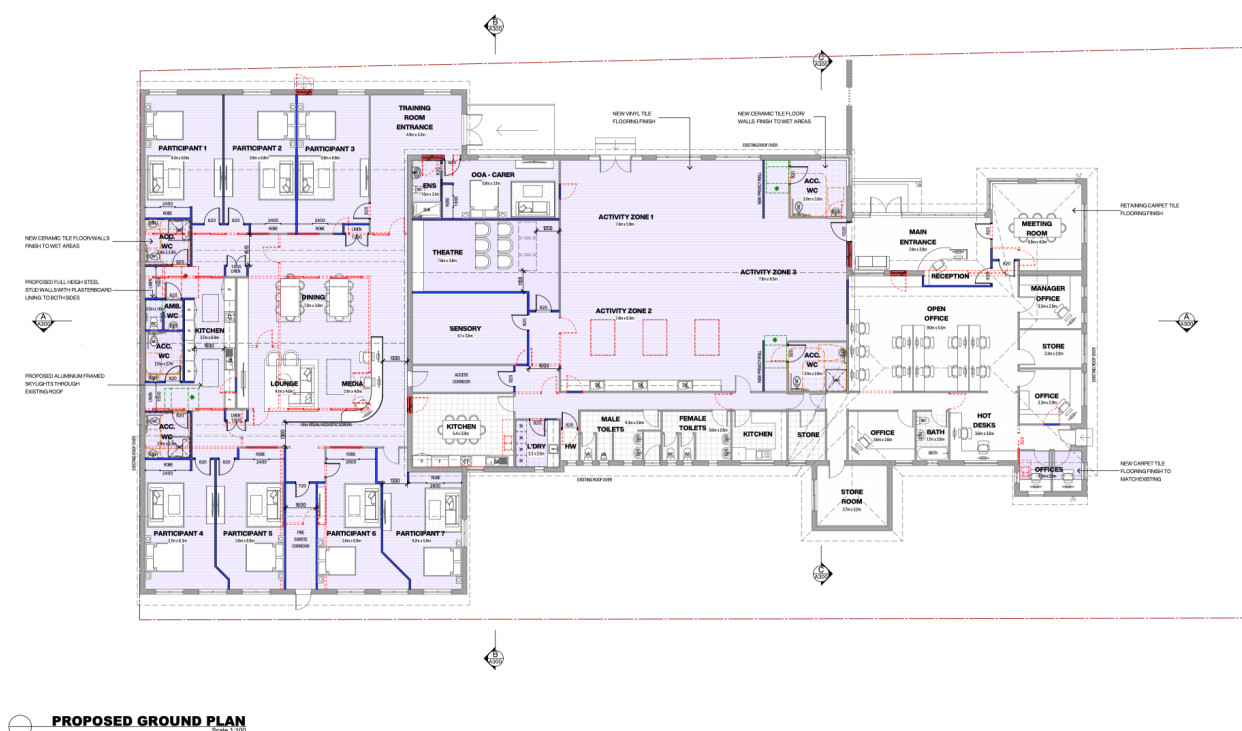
Proposed Floor Plan (source: Algorry Zappia & Associates)
